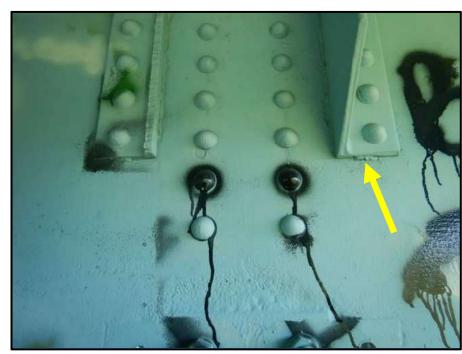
Tack weld at bottom of old stringer connection angles on floorbeam webs. These welds are fatigue prone in the main bay only.
